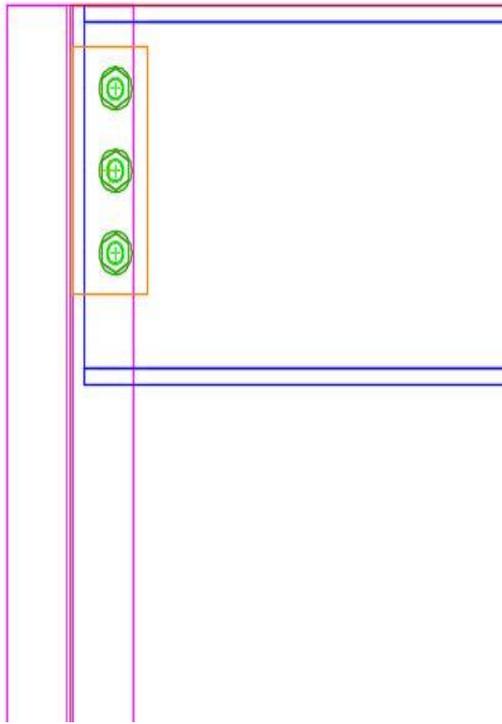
Elevation of Column & Beam shear plate connection in 2D wireframe.
